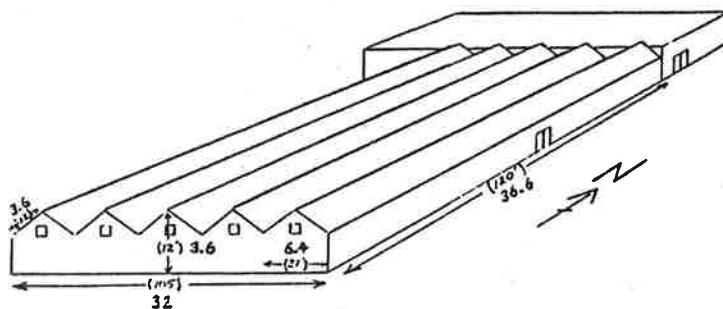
THE TYPE B GUTTER-CONNECTED GREENHOUSE
